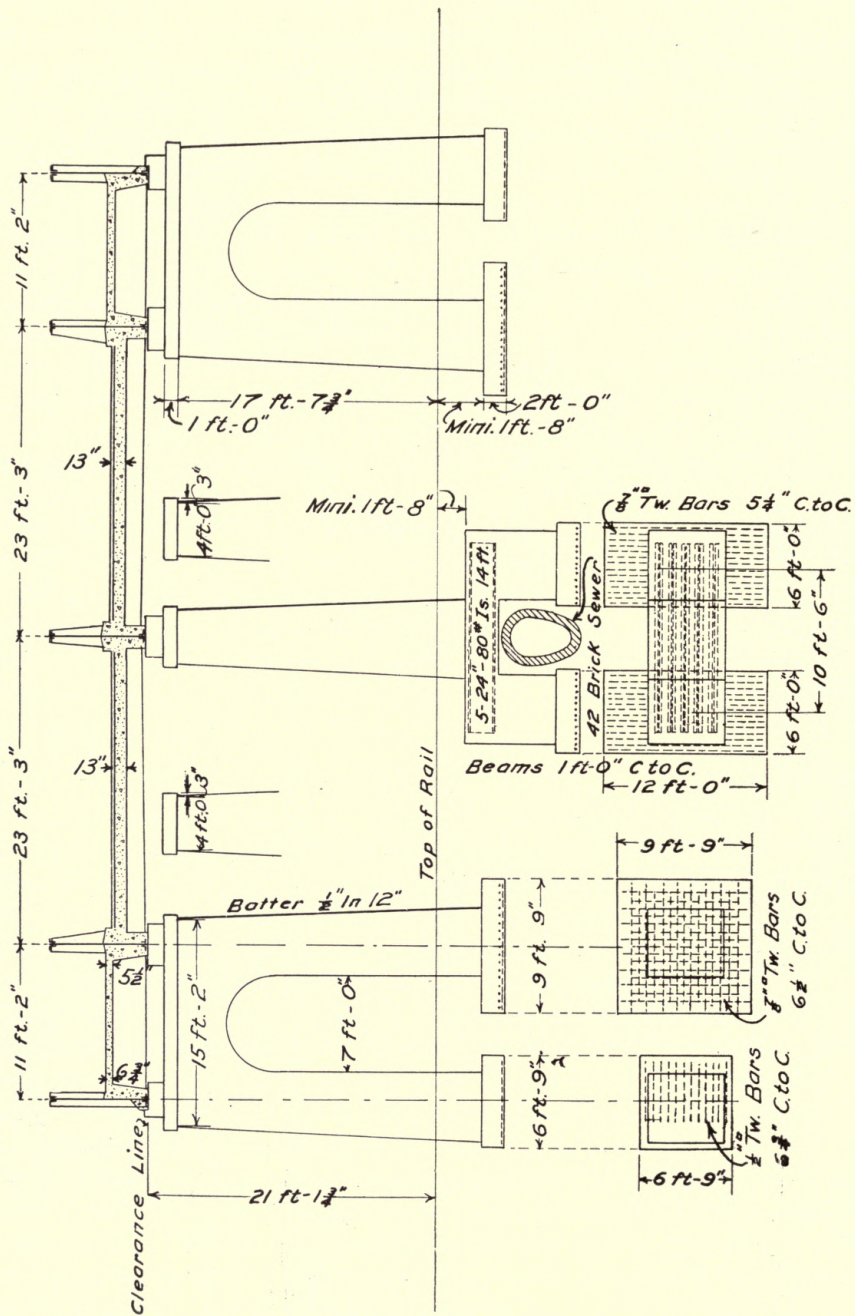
CROSS SECTION, FIRST AVENUE VIADUCT, L. I. R. R.
